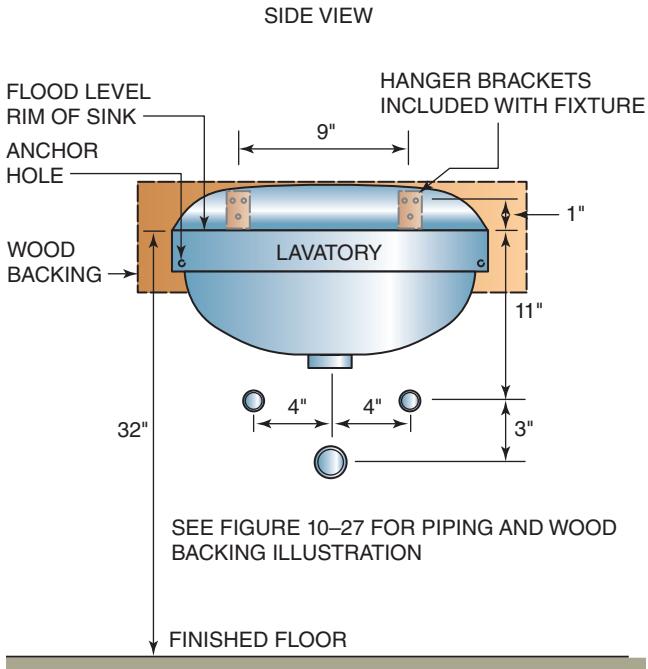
A manufacturer rough-in sheet provides important information about installing piping and fixture support in a wall.
